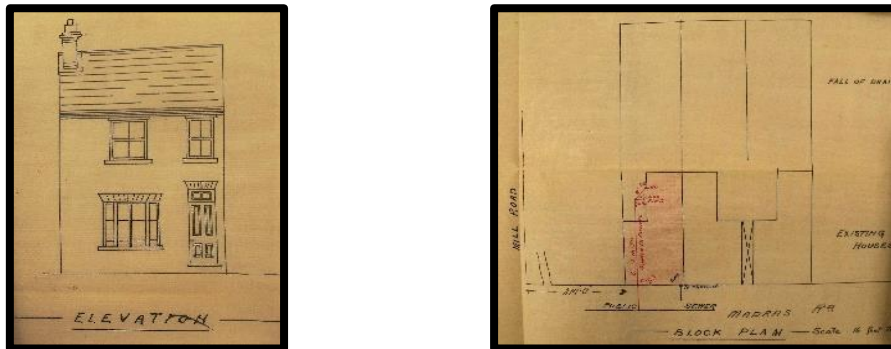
No. 14 Madras Road, proposed front elevation (CA CB/2/SE/3/9/103).
